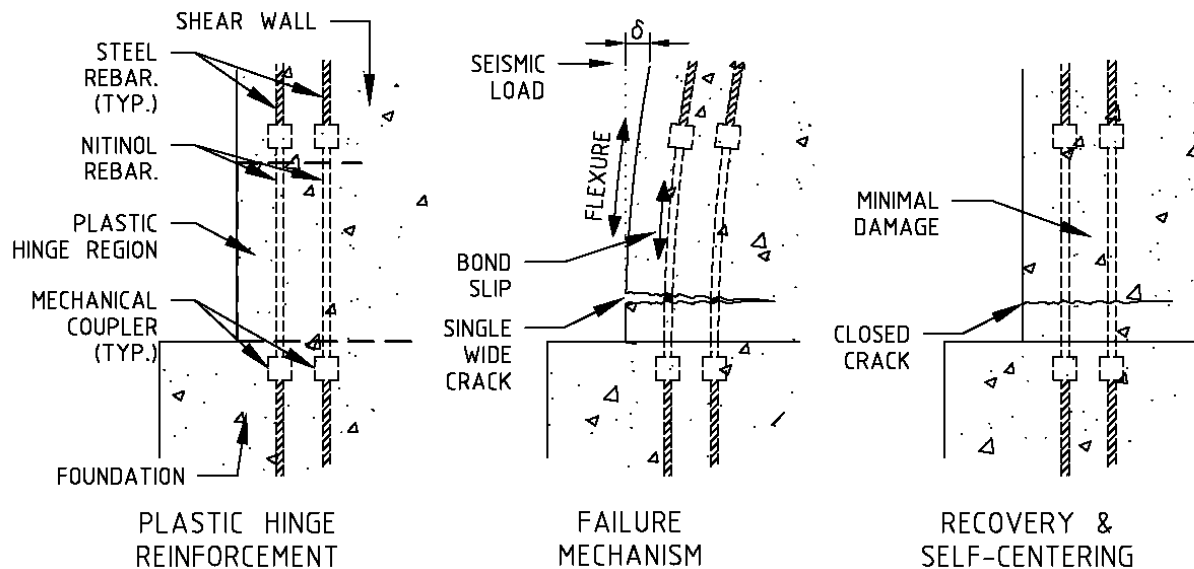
Function of Nitinol reinforcement in a slender concrete shear wall.
